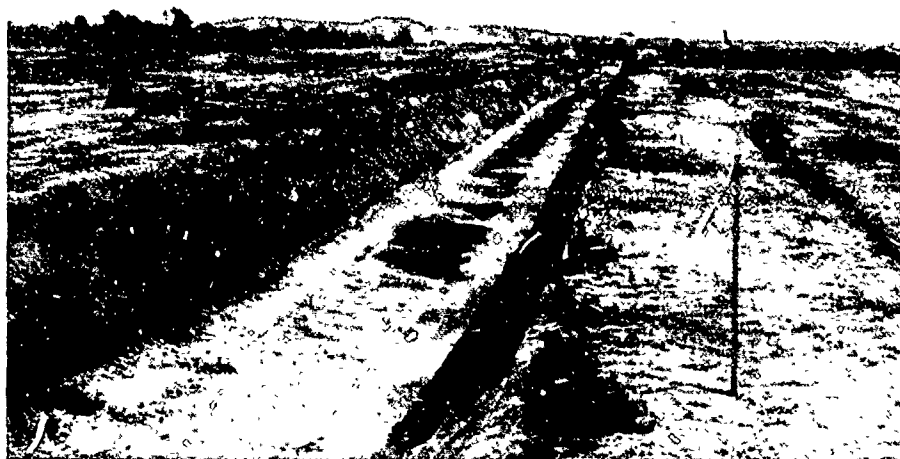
Right Abutment inspection trench looking east (Upstation)
